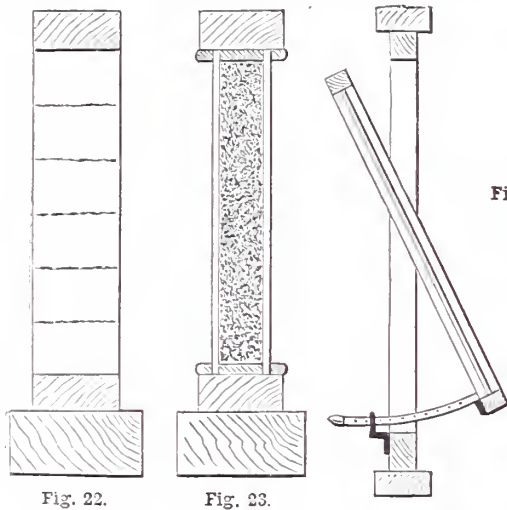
Alternative Mode of Filling in between Sill and Sashes with Brickwork.
